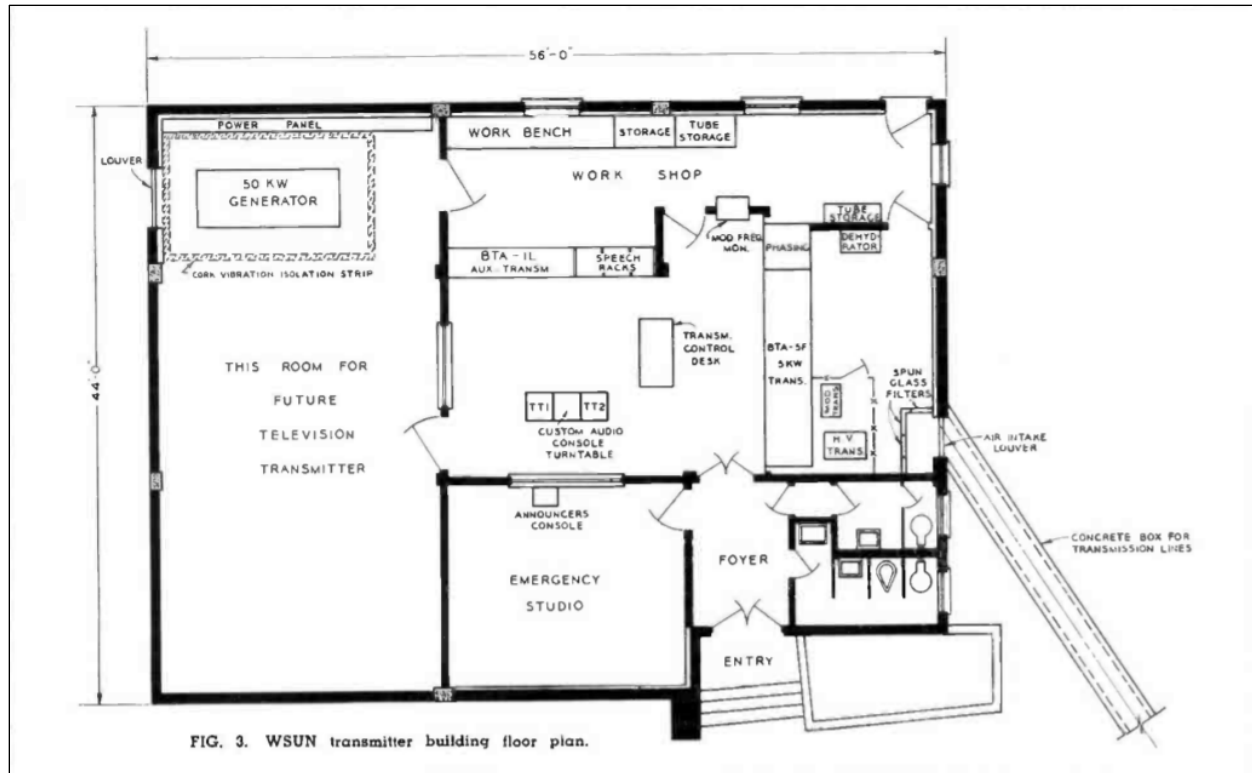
Floor plan of the WSUN Transmitter Building (8PI14032), as depicted in the July-August 1952 RCA Bulletin (Hayes 1952).
